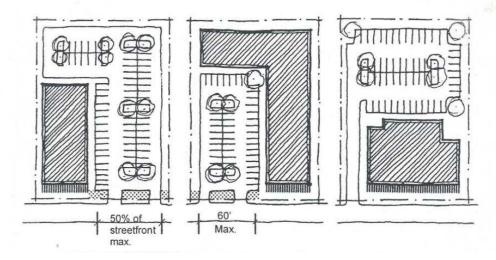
(f). Alternate Site plans illustrating different building configurations limiting parking lots in the front yard to give the building more prominence and utilize the site more efficiently.
